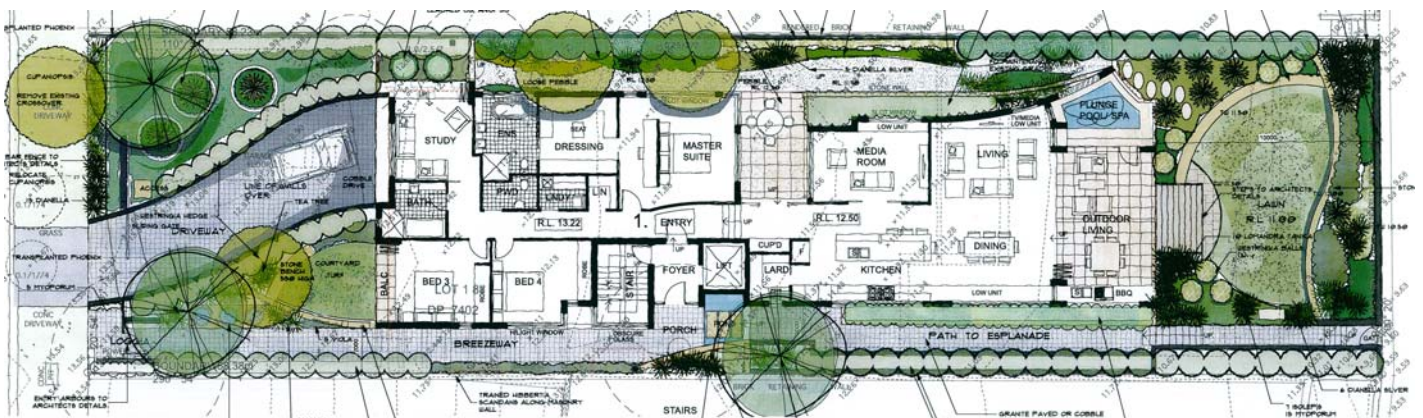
Indicative Site Plan with ground floor layout and landscaping shown (Arthur Avenue is to the left of the diagram and The Esplanade is to the right).
